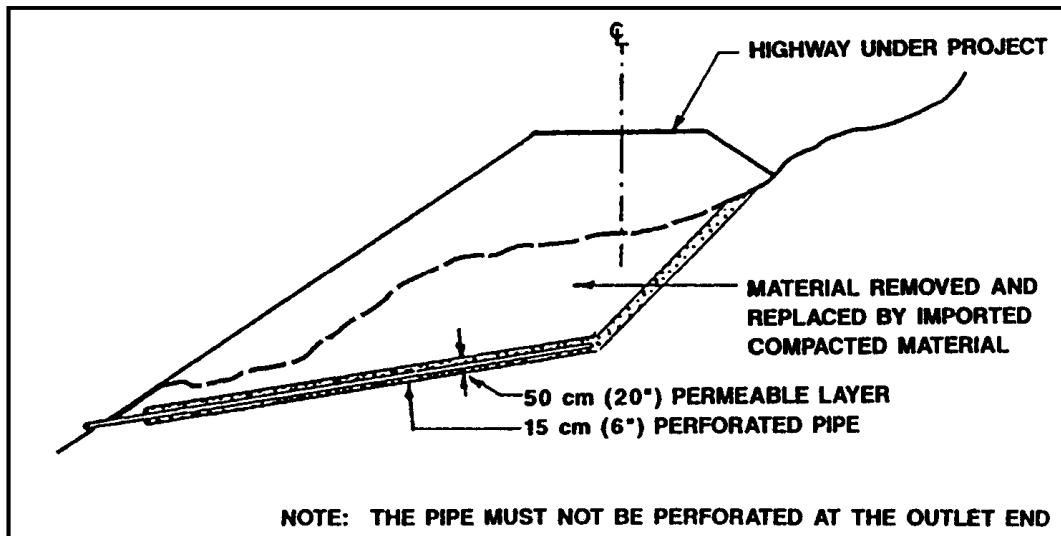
Placement of a drain blanket underneath embankments (Abramson et al., 2002).
